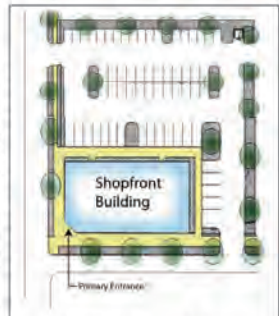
Shopfront Building Orientation. This diagram depicts Shopfront Building placement and entrance location.
